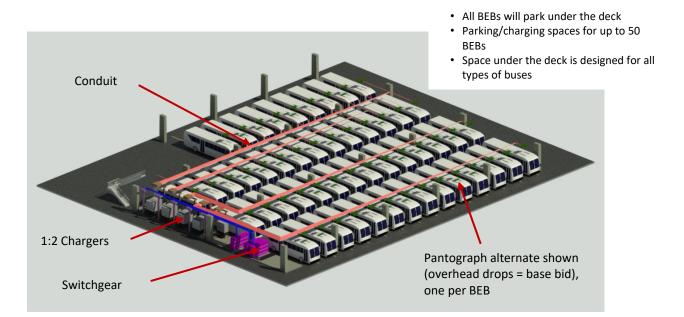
Division 4 Proposed BEB Installation Rendering
